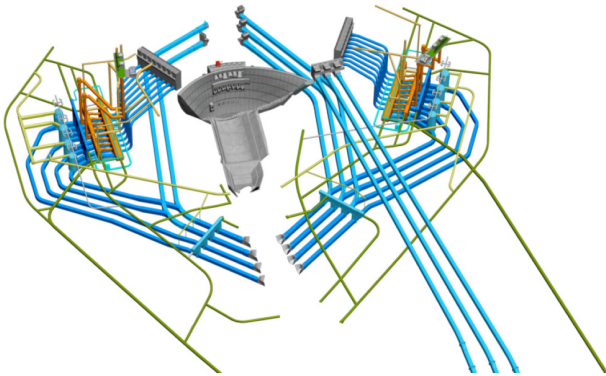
Building layout of Baihetan Hydropower Station hub.
